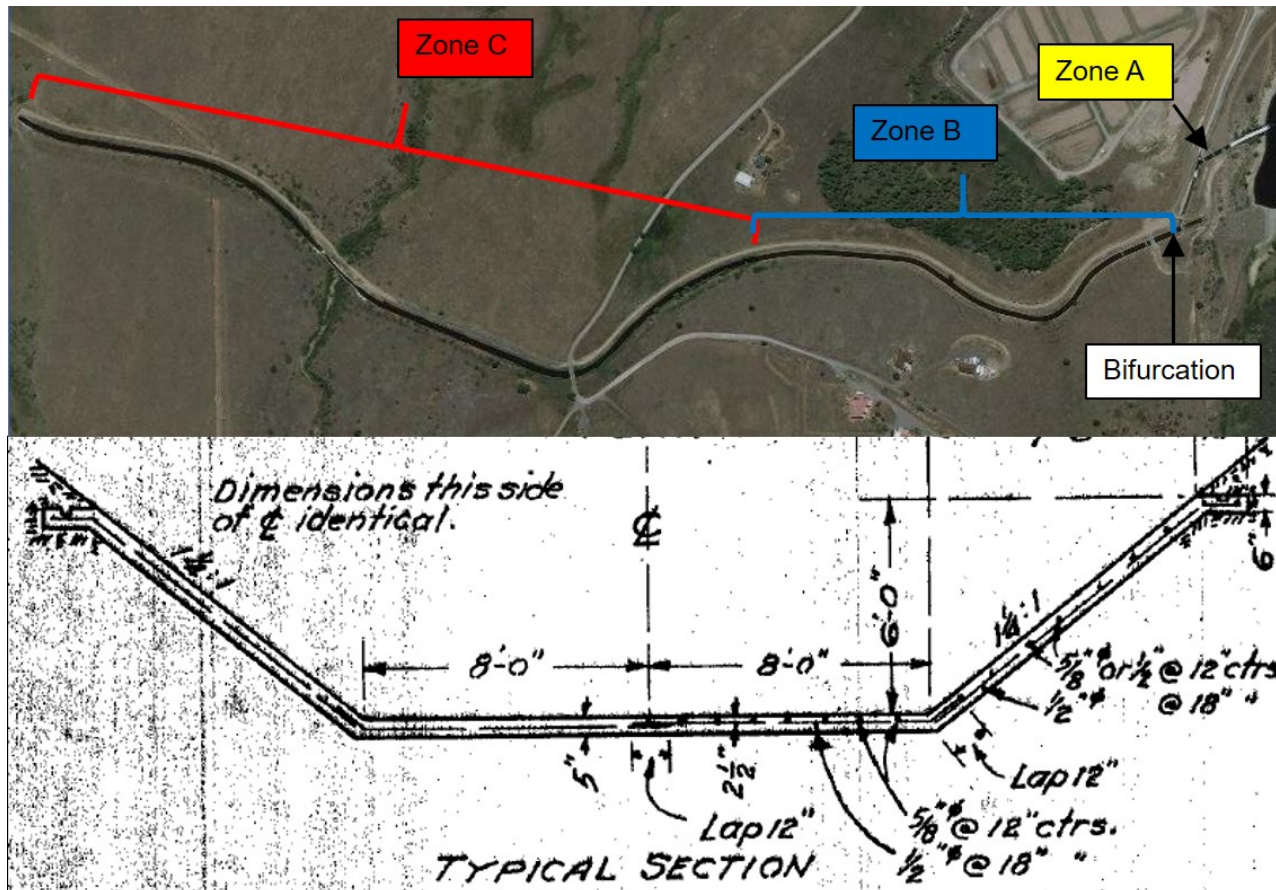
Aerial view of South Boulder Canal Test Zones C, B, and A (top – image from Reclamation's Tessel) and typical trapezoidal cross section of Zone B (bottom).
